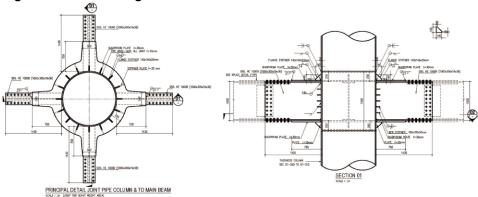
Detailed Drawing of CFT Beam-to-Column Connection
